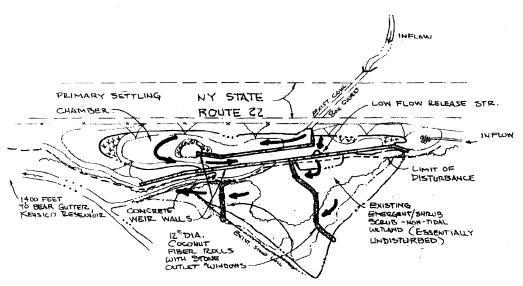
Bear Gutter Creek highway right-of-way urban stormwater retrofit (Claytor 1998).
